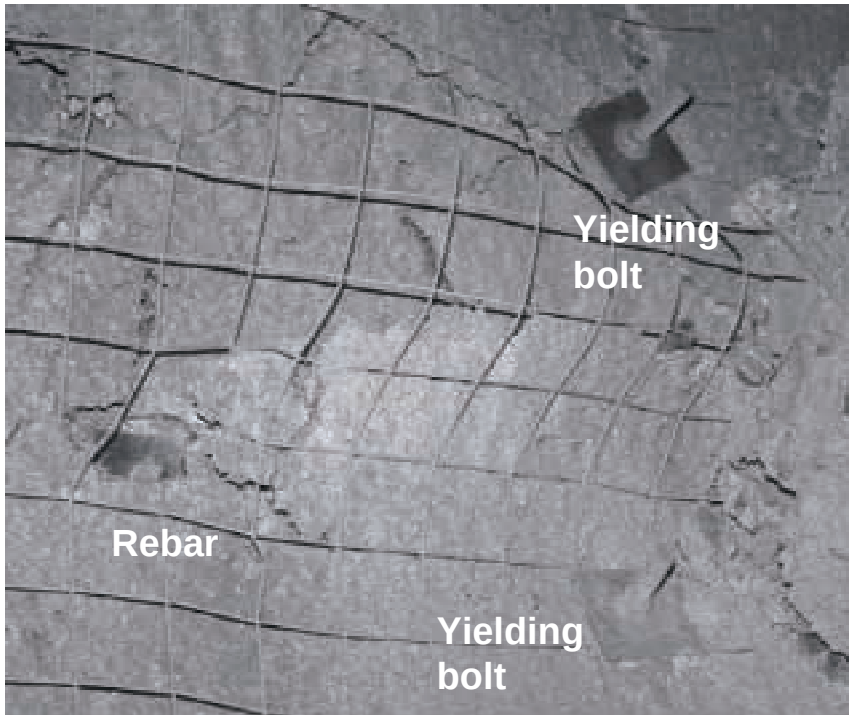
A rebar and two yielding bolts installed in a largely-deformed rock.
